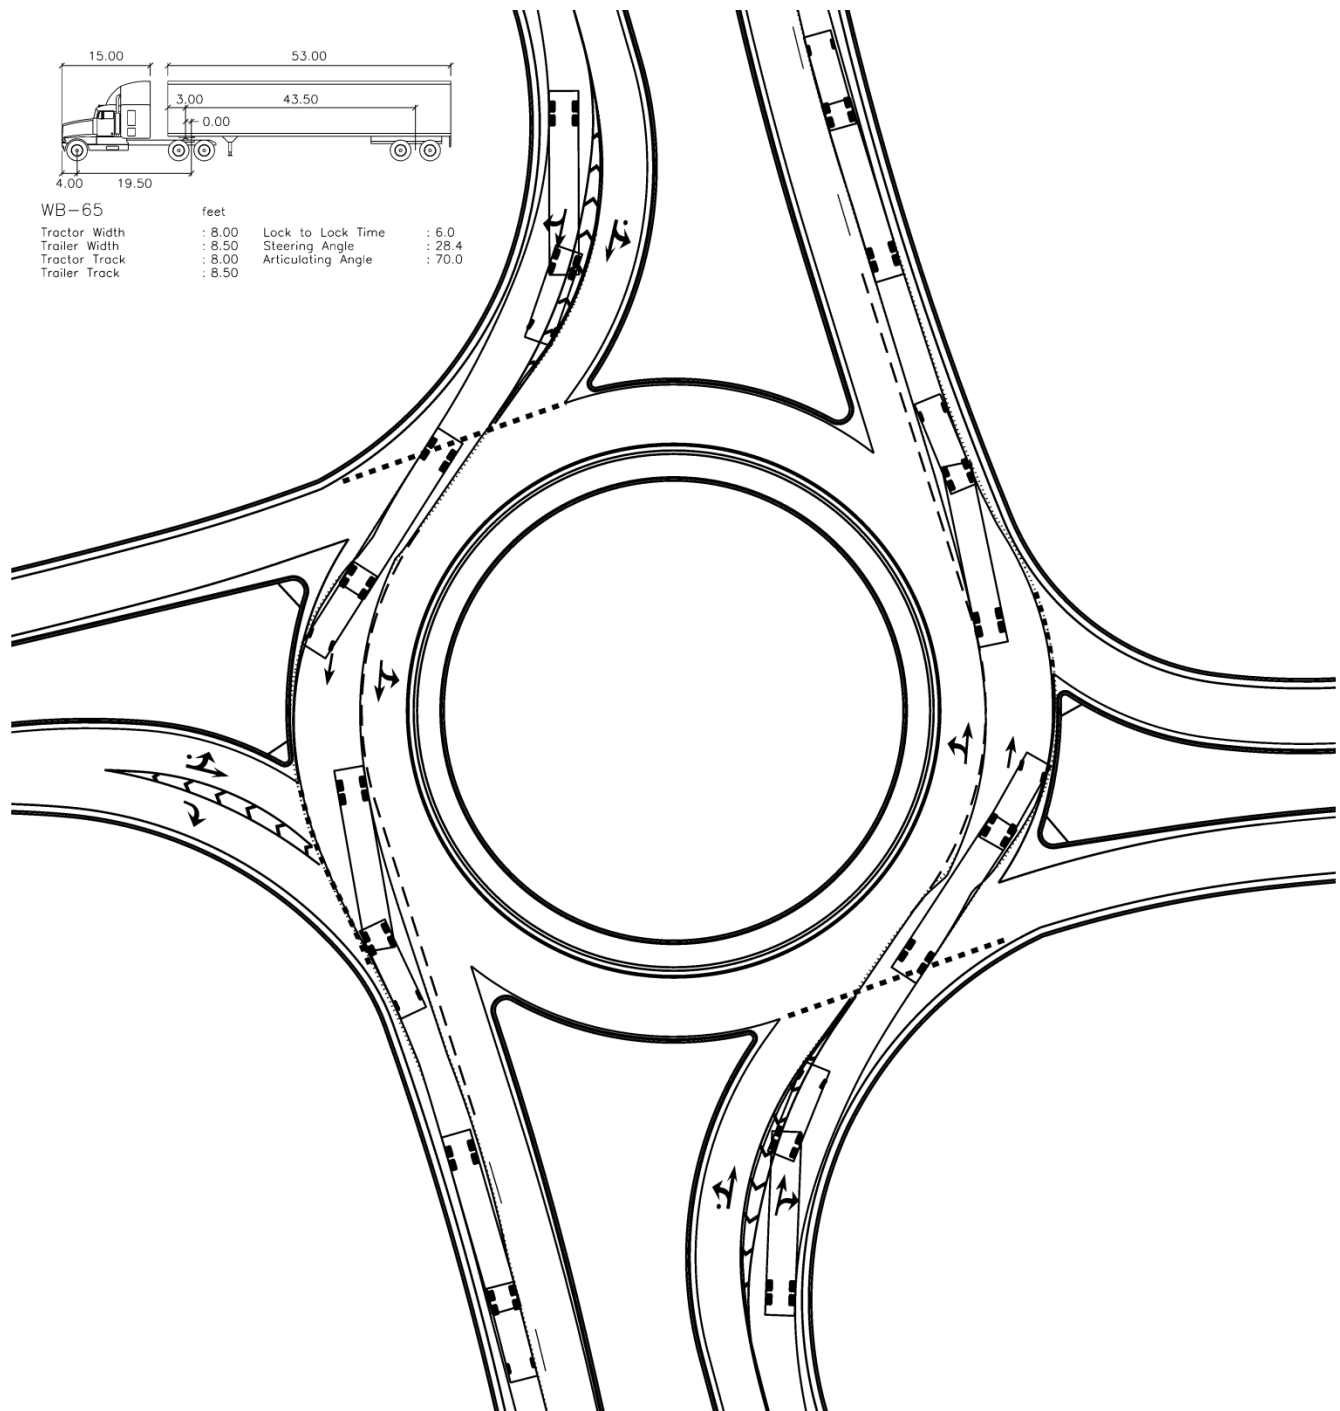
Case 3 Roundabout Design (6-ft to 8-ft gore pavement marking between lanes)
